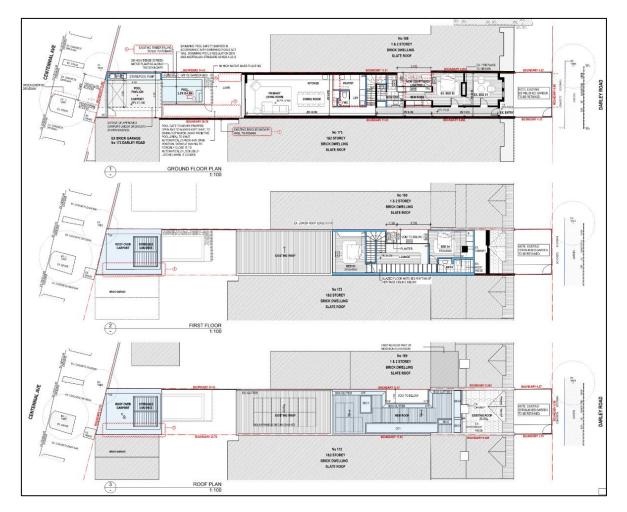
Extract of proposed Ground Floor, First Floor and Roof Plan (Source: Ahron Best Architects).
